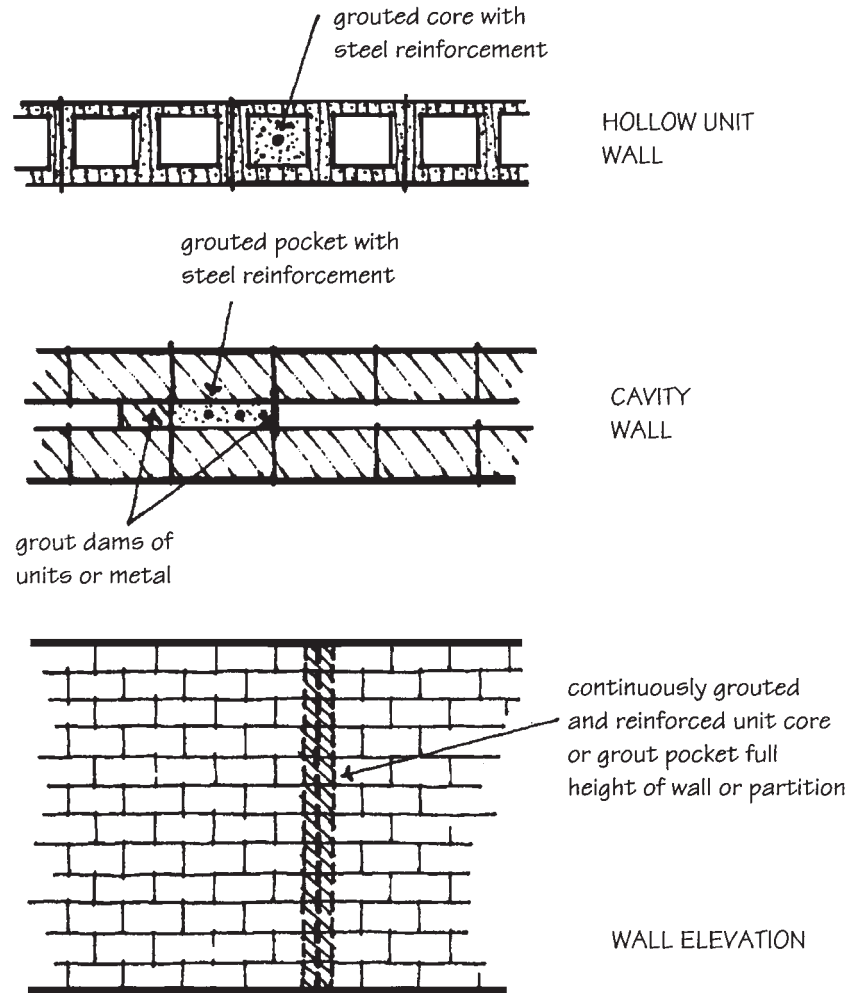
In-wall columns provide lateral support for empirically designed hollow unit masonry walls and cavity walls.
